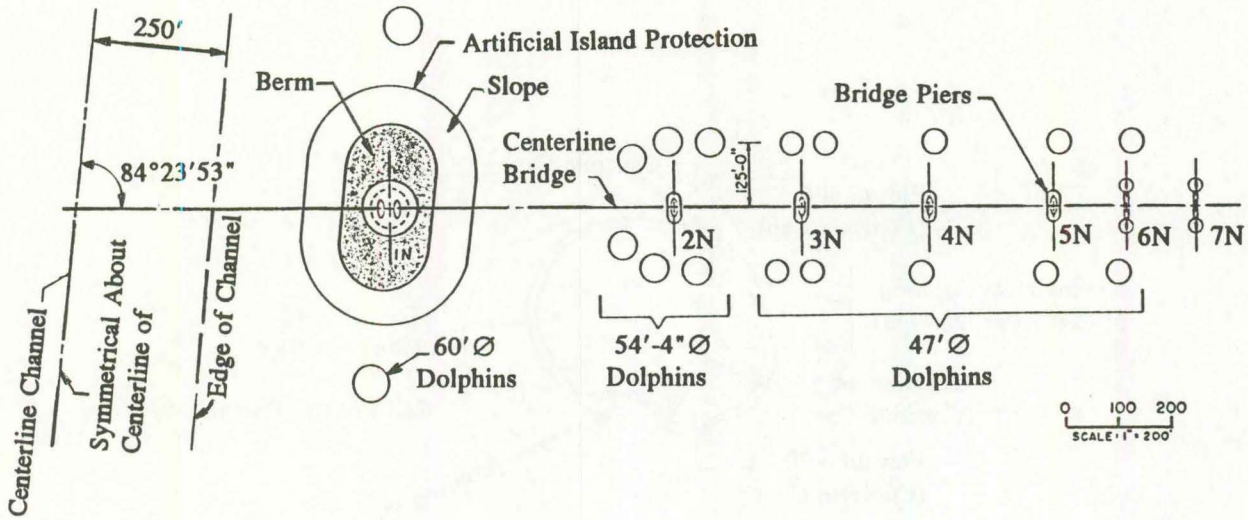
Dolphin and Island Protection System Plan for the Sunshine Skyway Bridge, Tampa Bay [16].
